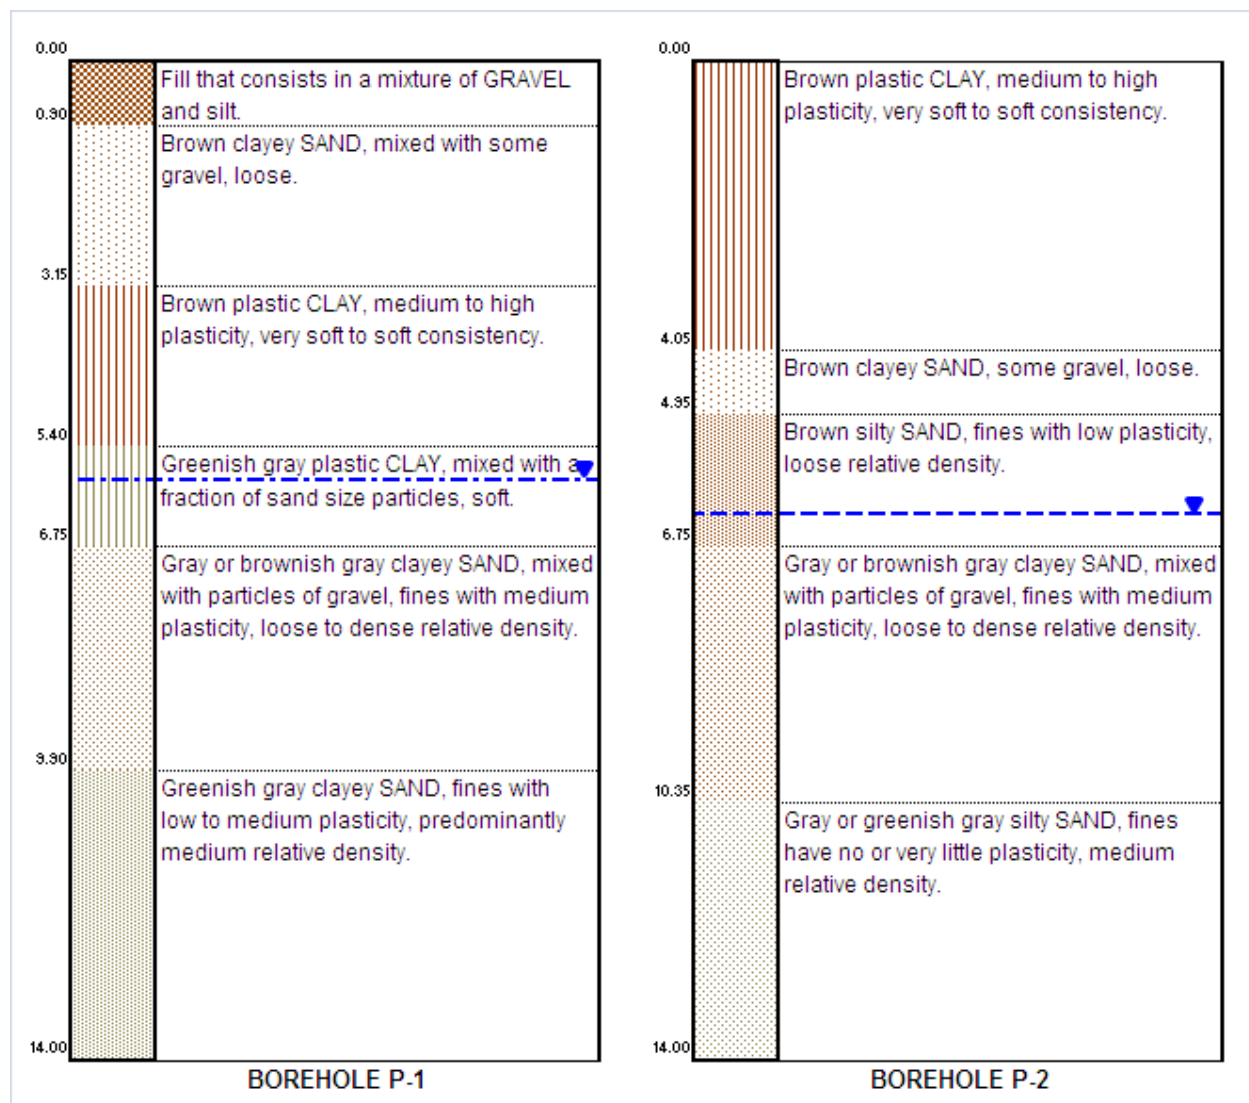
Soil profile detected at the Río Bananito Railroad Bridge site
